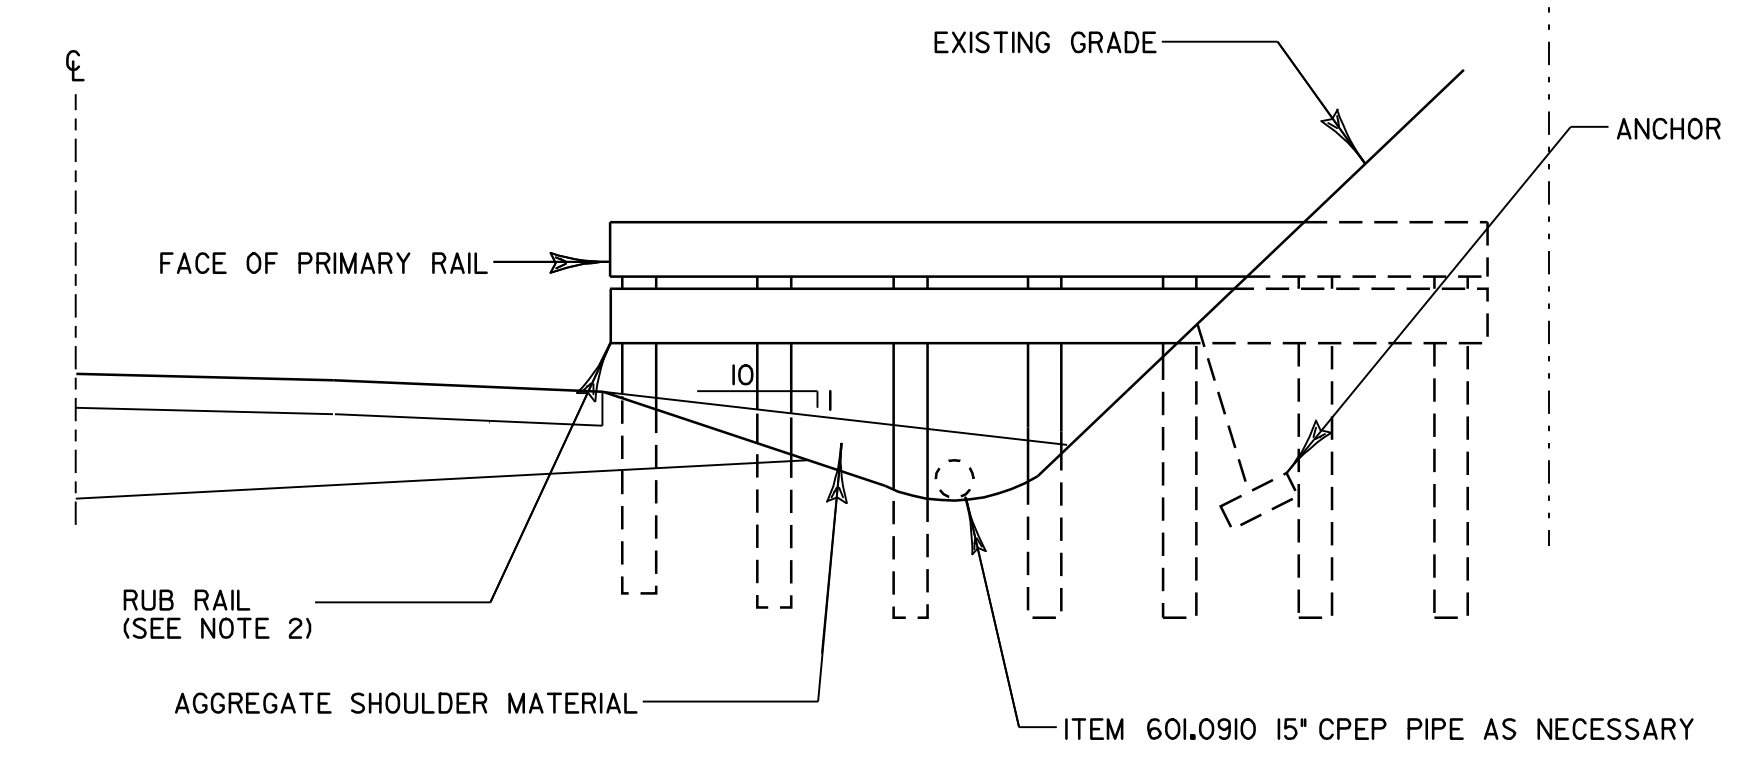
DETAIL FOR BURIED GUARDRAIL ENDS INTO BACKSLOPE WITH RUBRAIL
